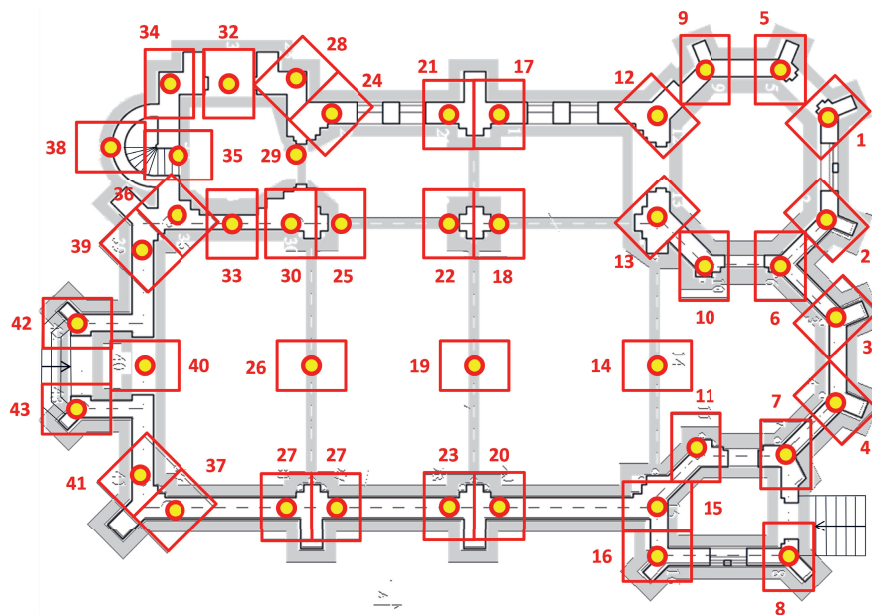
Steel reinforcement of church's walls and jack's configuration chart
